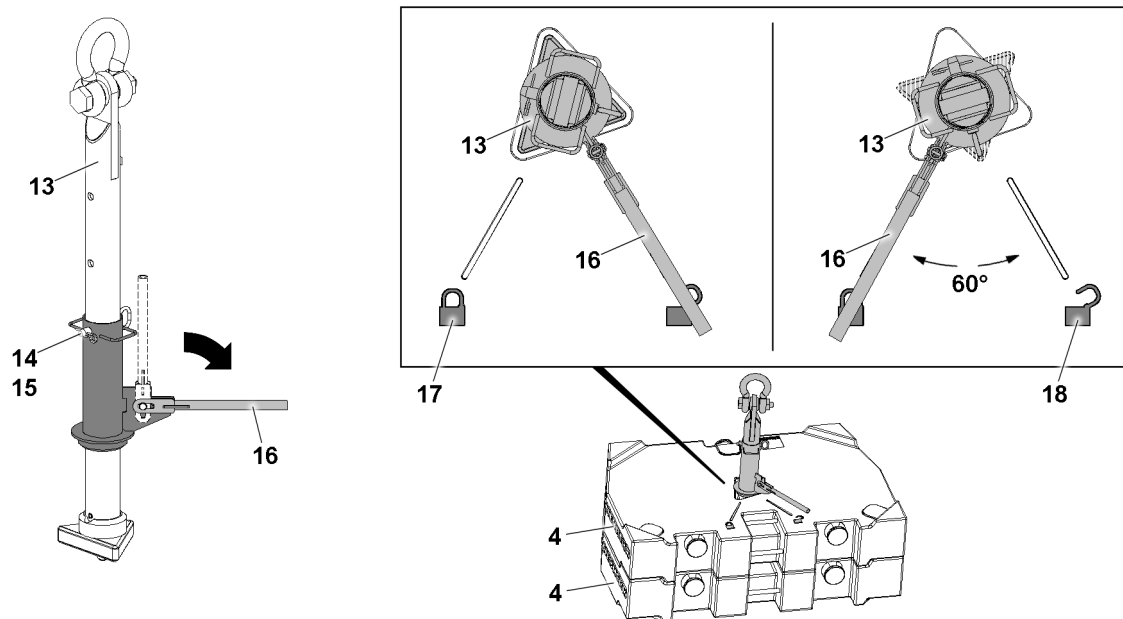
Placing the ballast plates 4, fastening system: "Twistlock"
